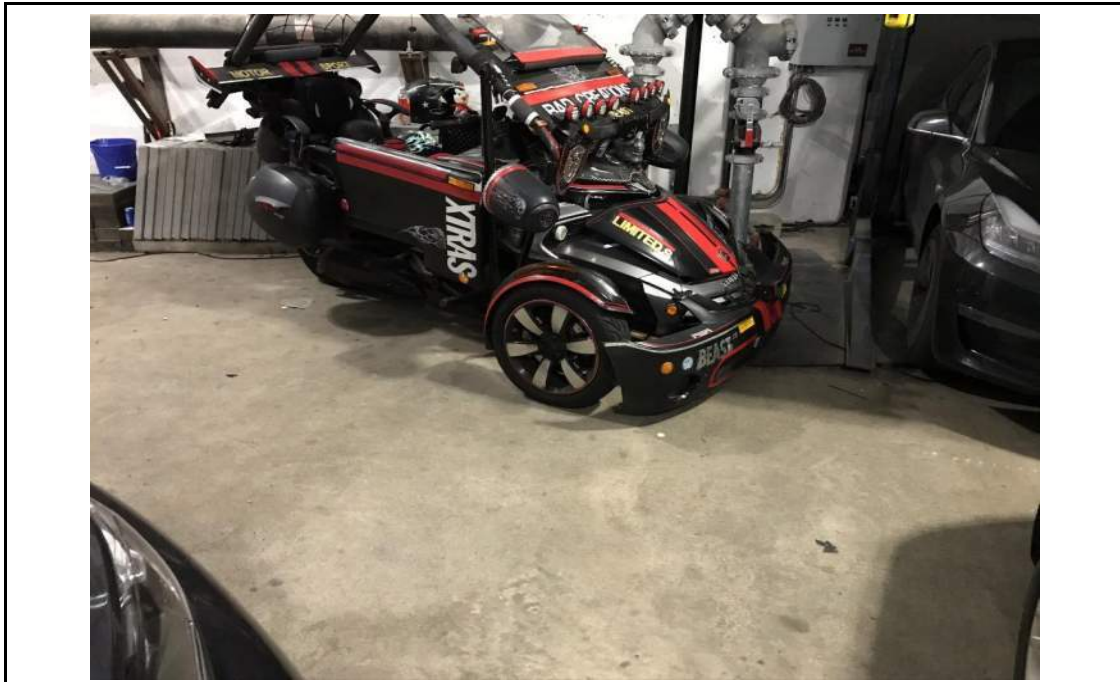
Subgrade parking lot concrete slab, facing east. 6 February 2020.
